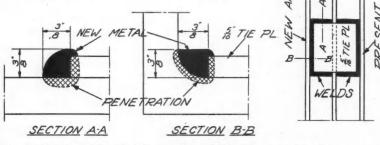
Details of Welded Connection of Tie Plates to Old Columns and New Reinforcements.
